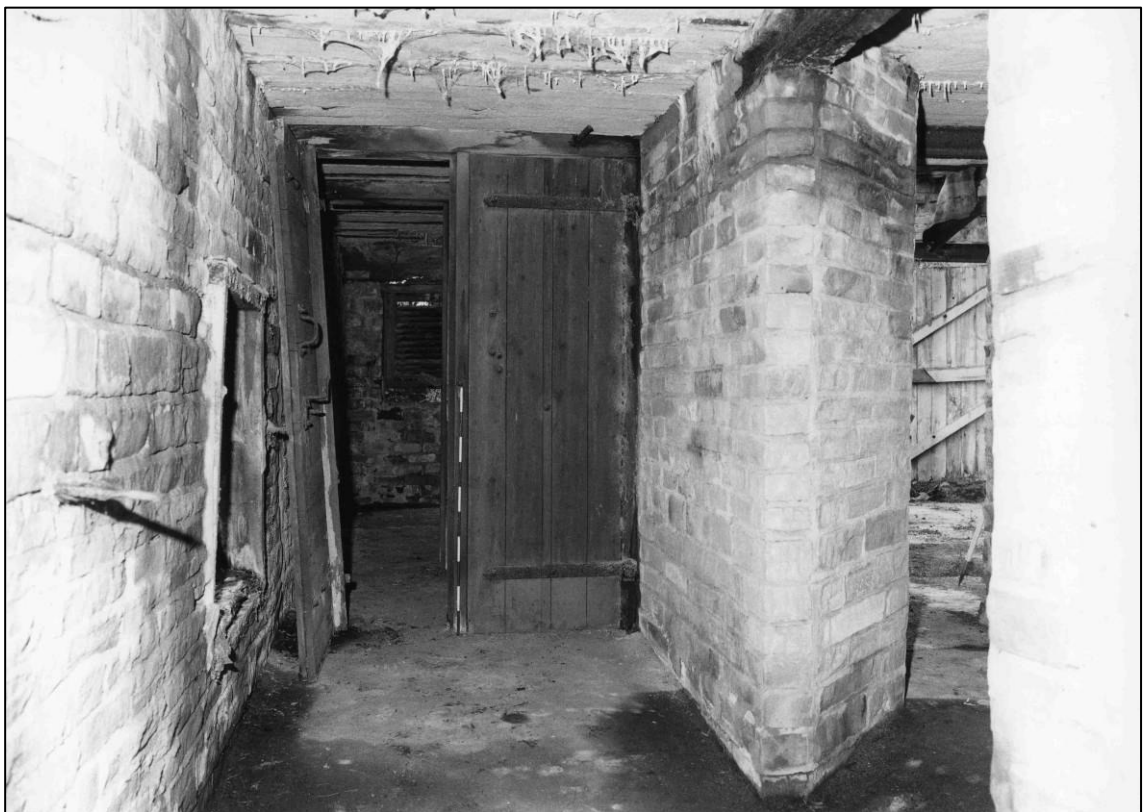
Building N4, interior to fan passage, looking E (photo 4/9).
